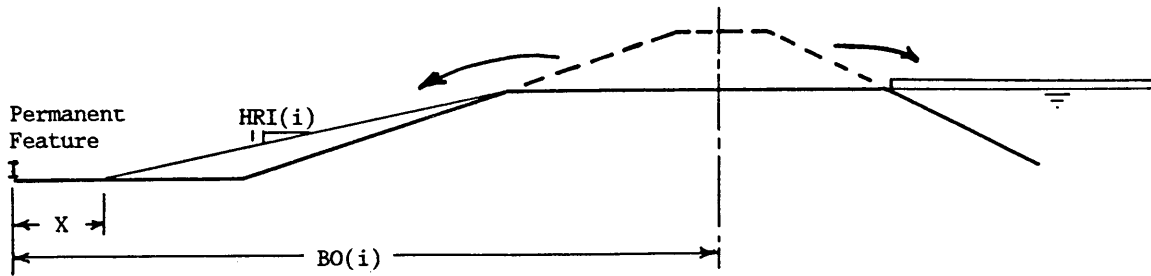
Case 1 Cross Section: Distributing Fill to Toe and Cap
